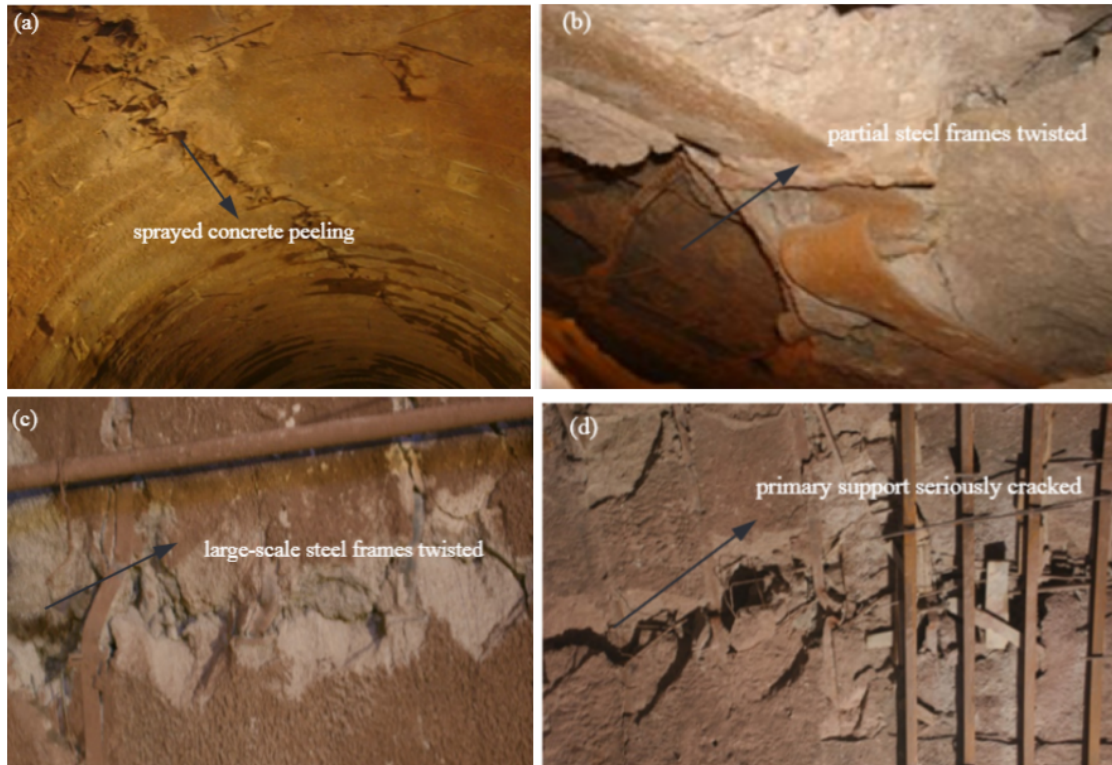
Tunnel failure in Laodongshan tunnel. (a) Peeling of sprayed concrete ; (b) Twisted partial steel frames; (c) Twisted large-scale steel frames; (d) Serious crack on primary support (Cao et al., 2018)
